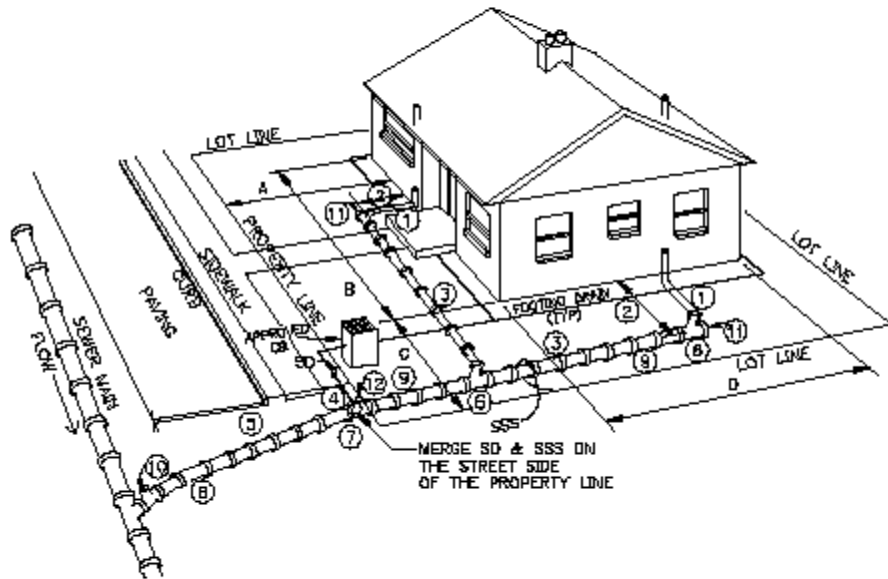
EXHIBIT D. FOOTING DRAIN CONNECTION TO AN APPROVED PRIVATE INLET BASIN PRIOR TO DISCHARGE INTO COMBINED SEWER SYSTEM
